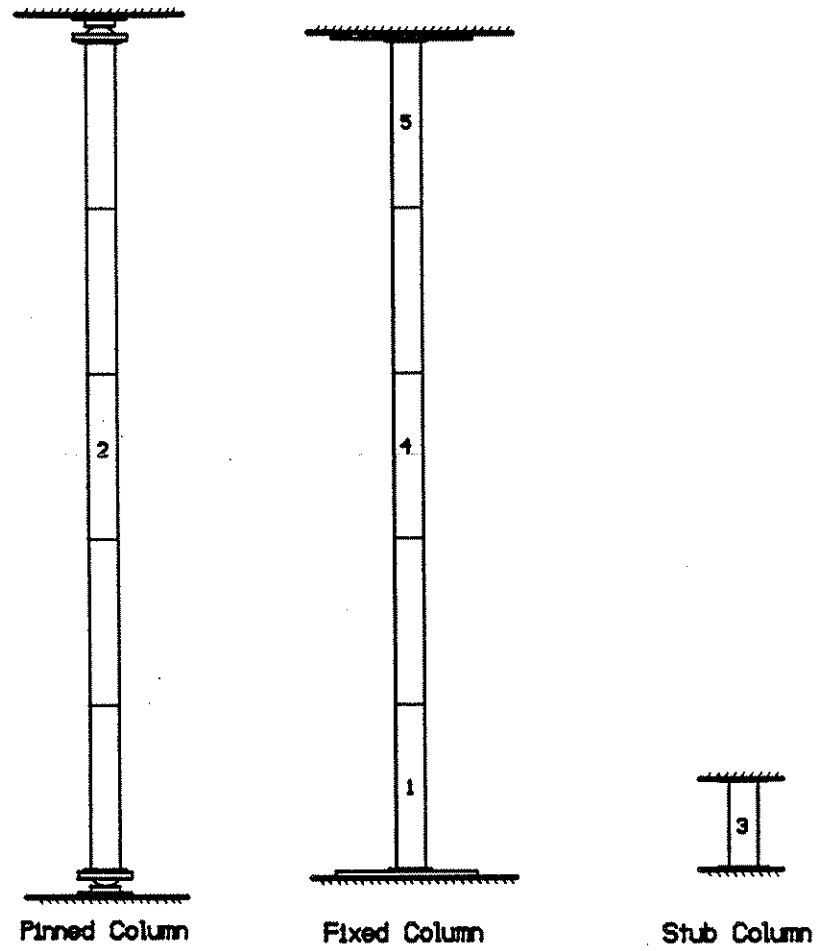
Layout of Steel Plate for Fabricated Specimens
